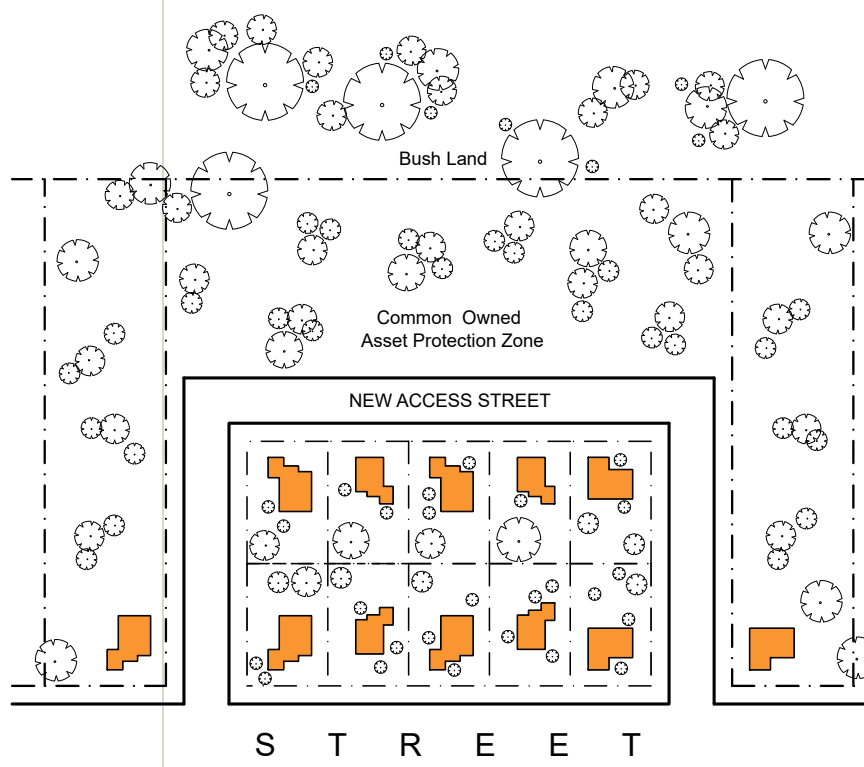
A.5-1. Subdivision of lots, sharing access road between development and APZ
